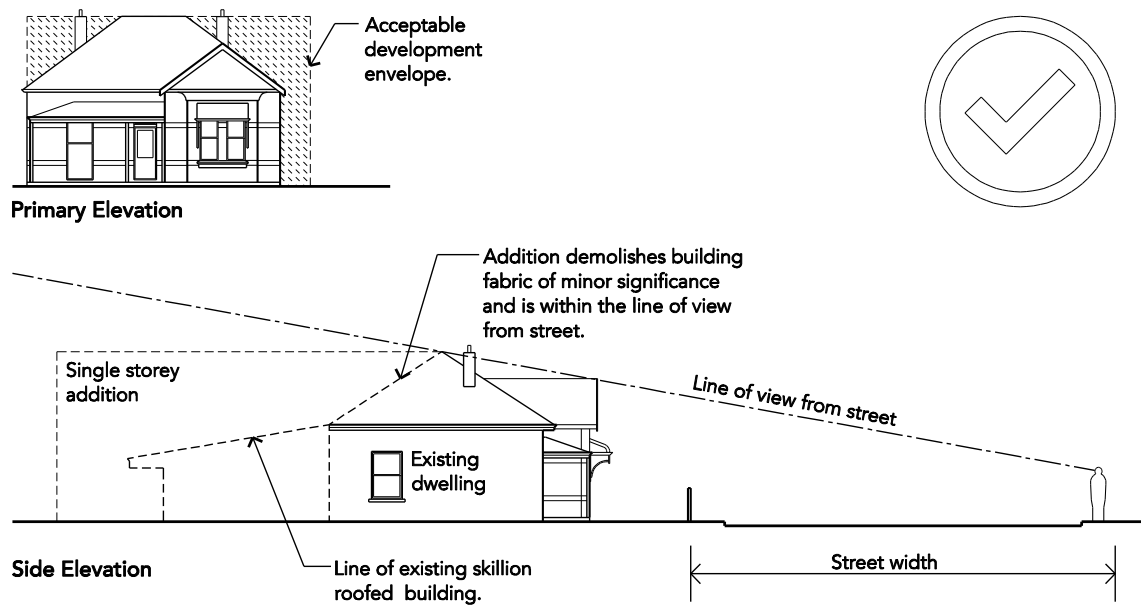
Elevations illustrating compatible alterations and additions – *Griffiths Architects 2012.
